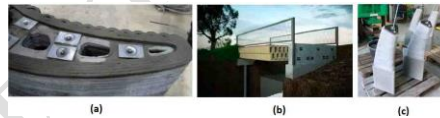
Prestressed reinforced concrete members include: (a) a concrete bench, (b) the conceptual design of a concrete bridge deck as proposed by Salet et al. (2018), and (c) a concrete column (Da Silva et al., 2018)
